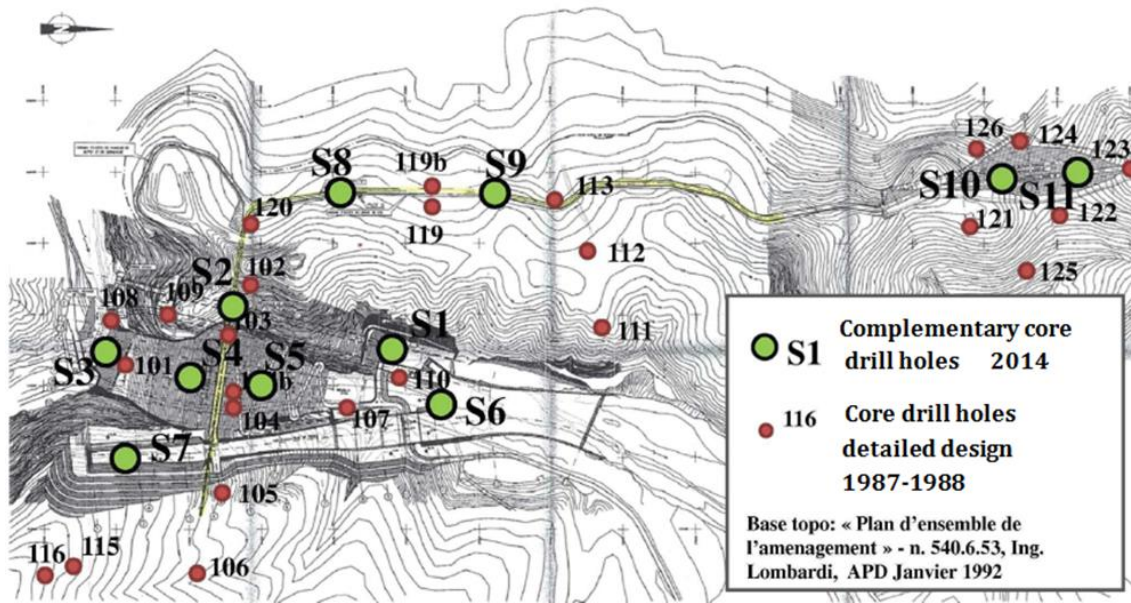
Plan view of the boreholes position in the Souk Tleta dam site ANB [35]
